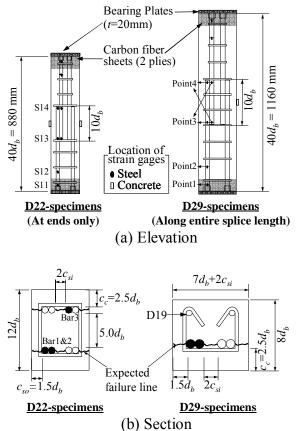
Details of specimens. (Note: S14 refers to a strain at point 4 of bar 1.)
